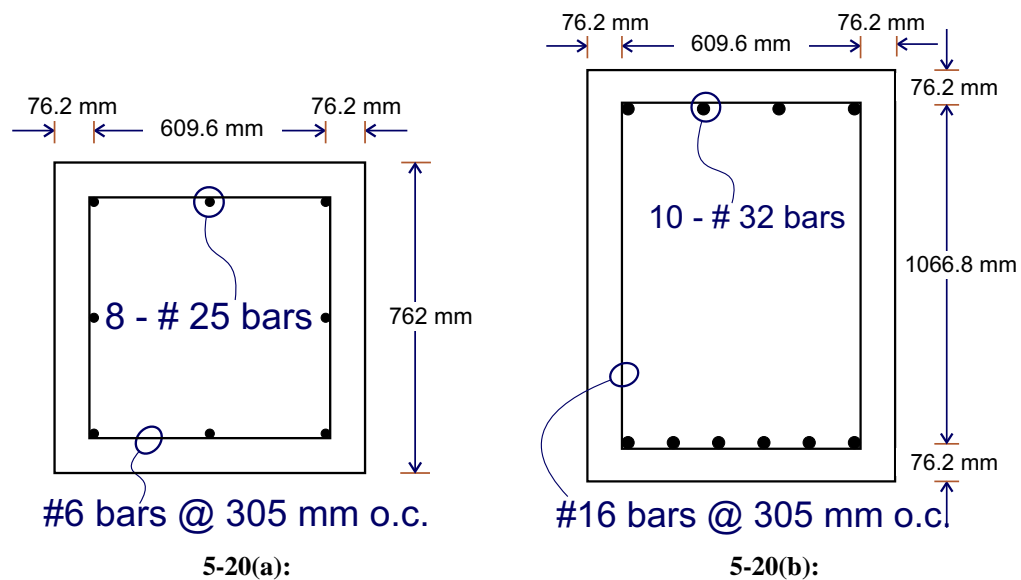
Reinforced Concrete Member Reinforcing Layout for Slab Type Bridges (a) Bent Beam (b) Columns.
